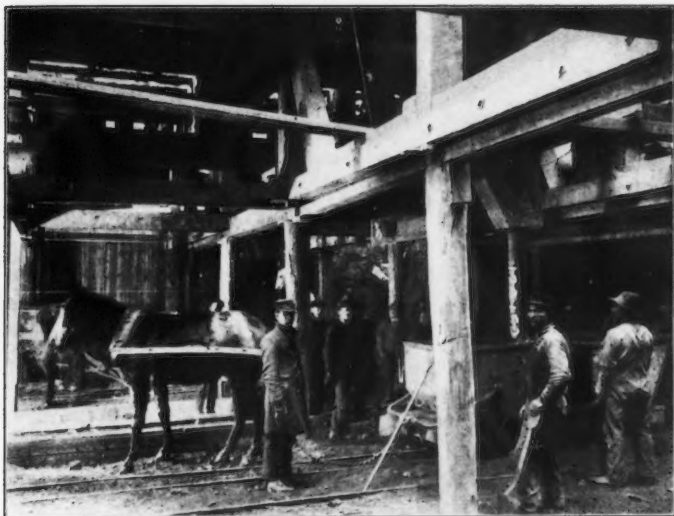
TYPE OF BRACING IN FULTON ST. SUBWAY, BROOKLYN.
